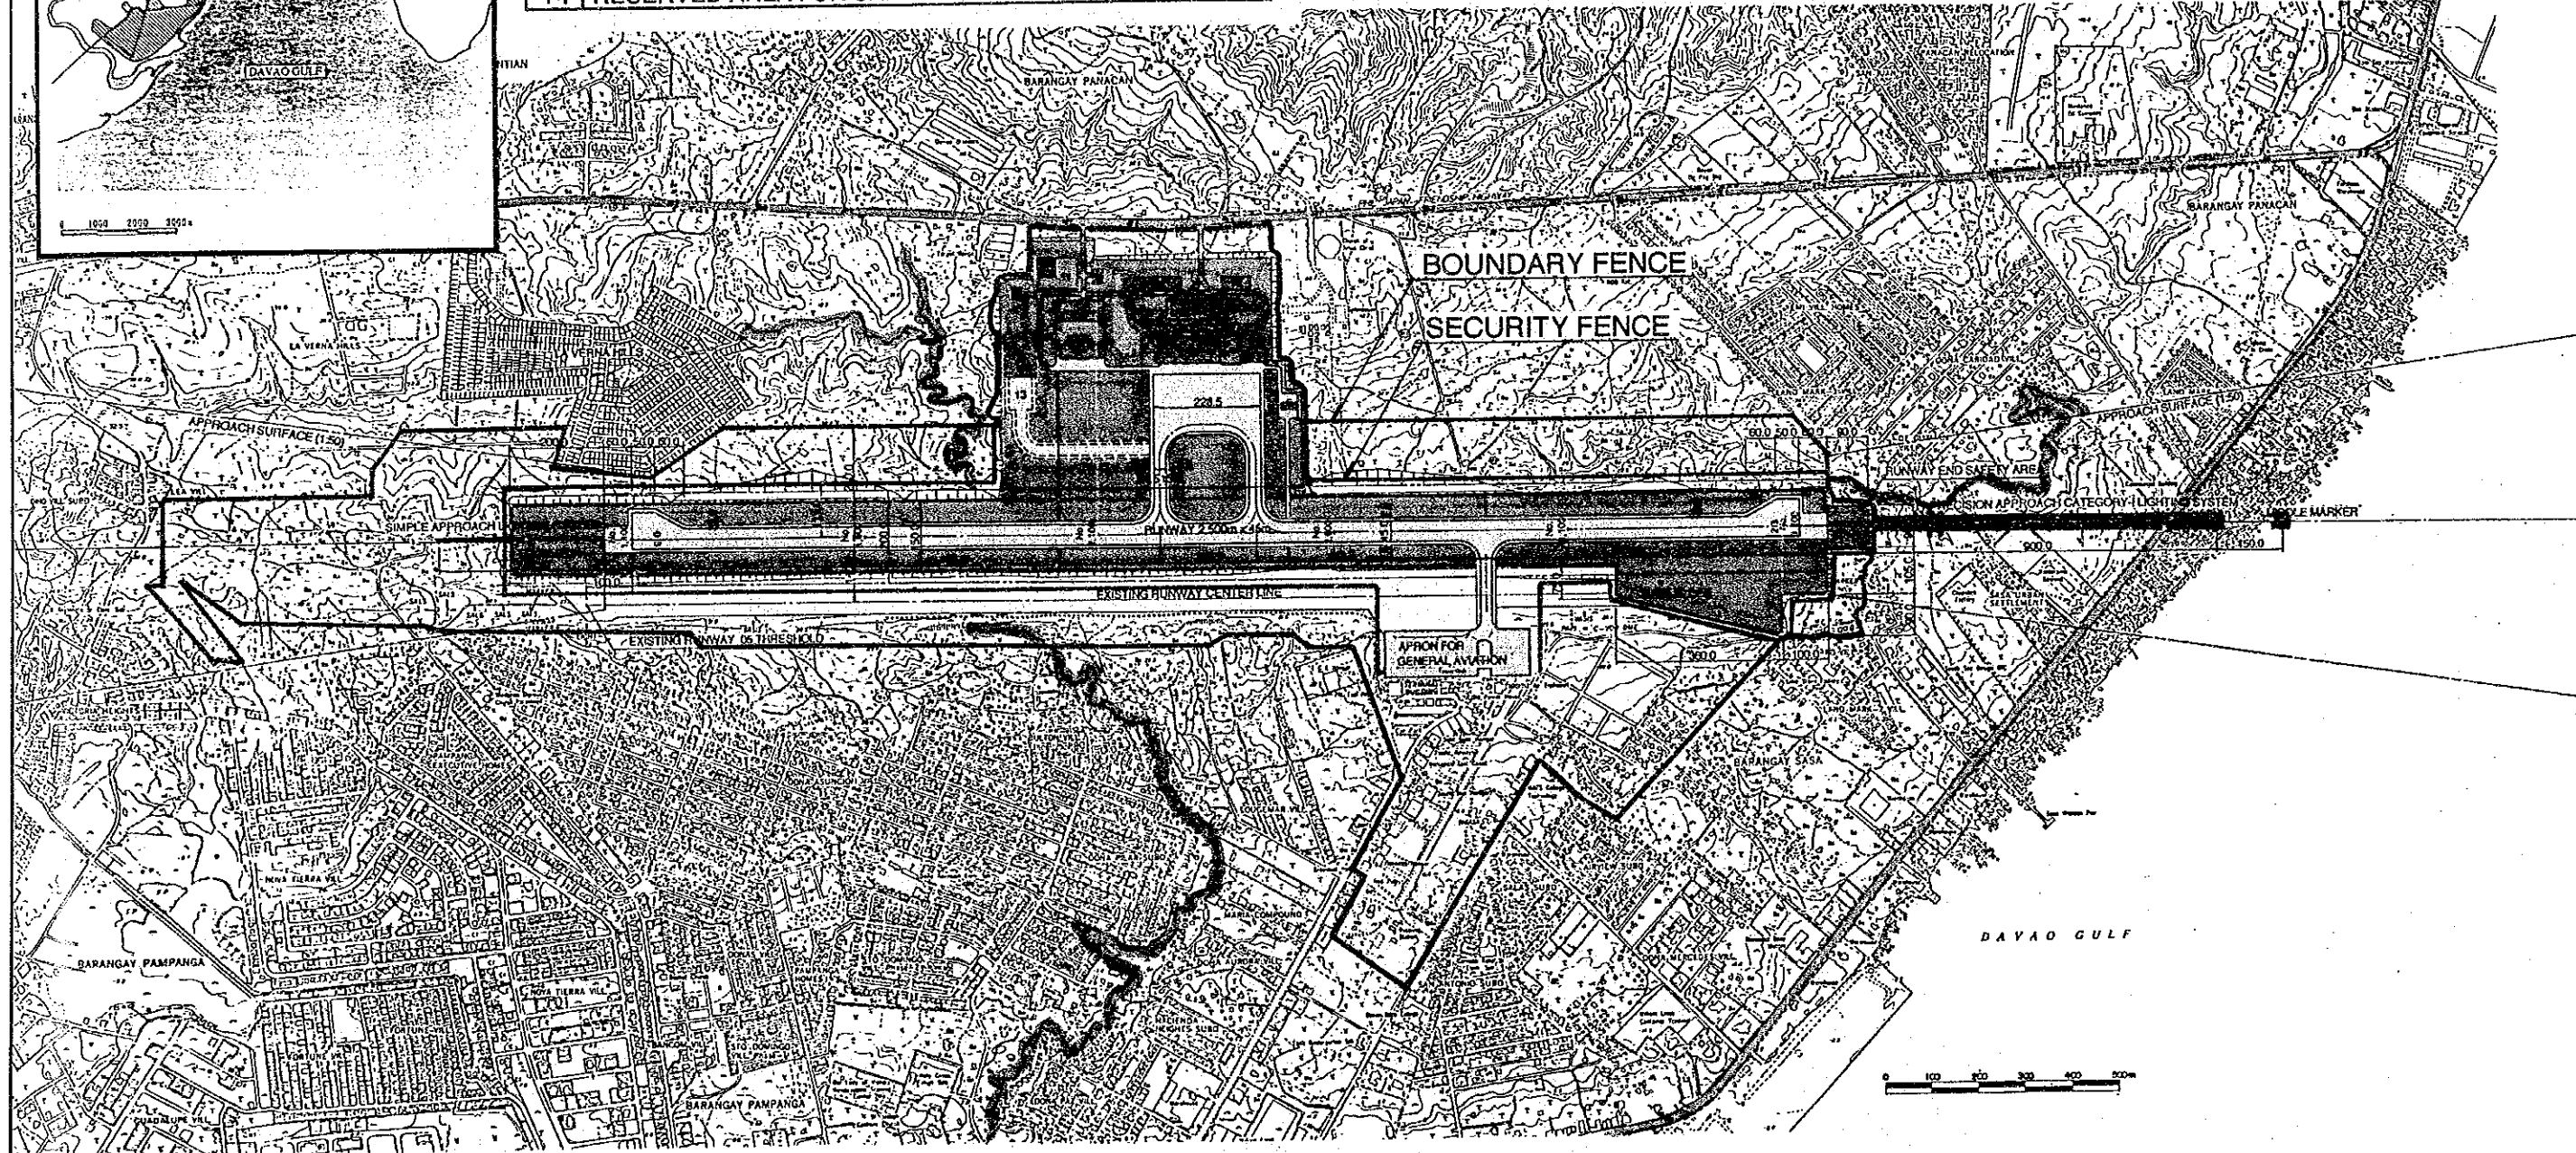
Airport Layout Plan of Medium-Term Development Plan.
